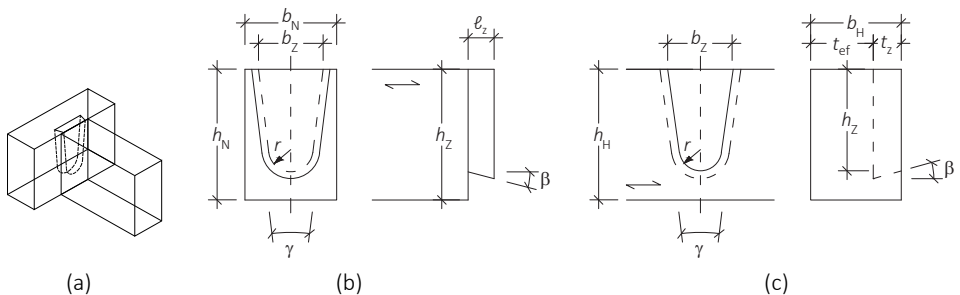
Single-sided dovetail joint, (a) 3D overview, (b) joist, (c) header.
